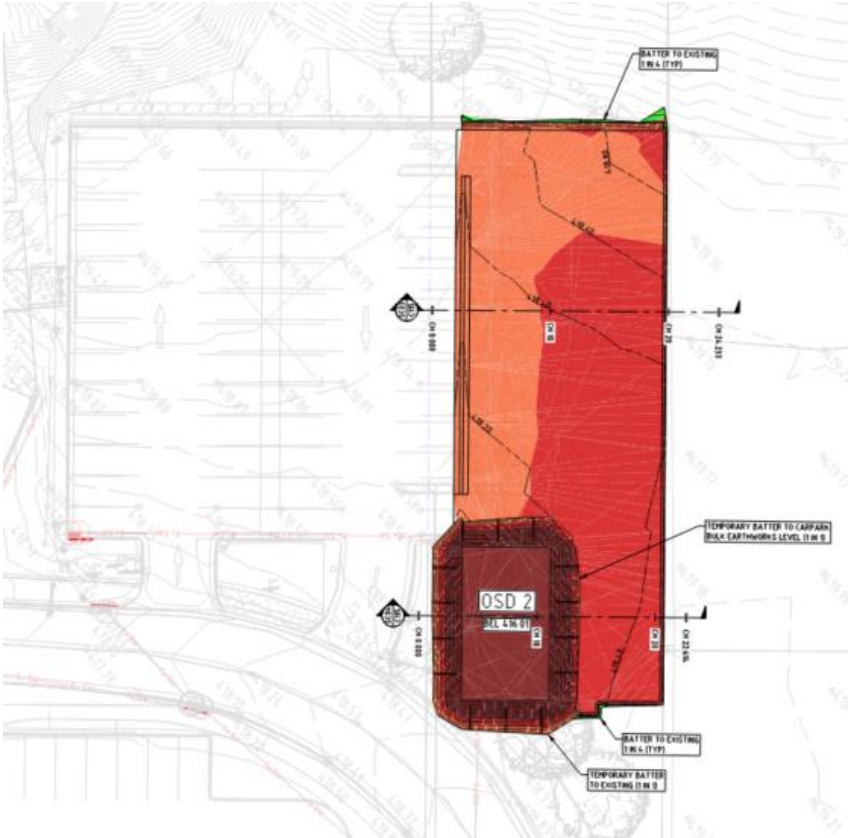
Northeast Carpark D Extension Site Bulk Earthworks
